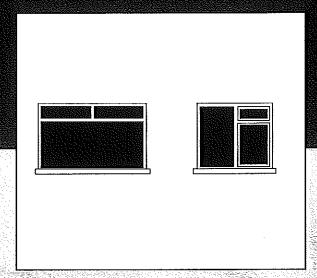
WINDOWS - Poor modern horizontal patterns accepted where matching main house
